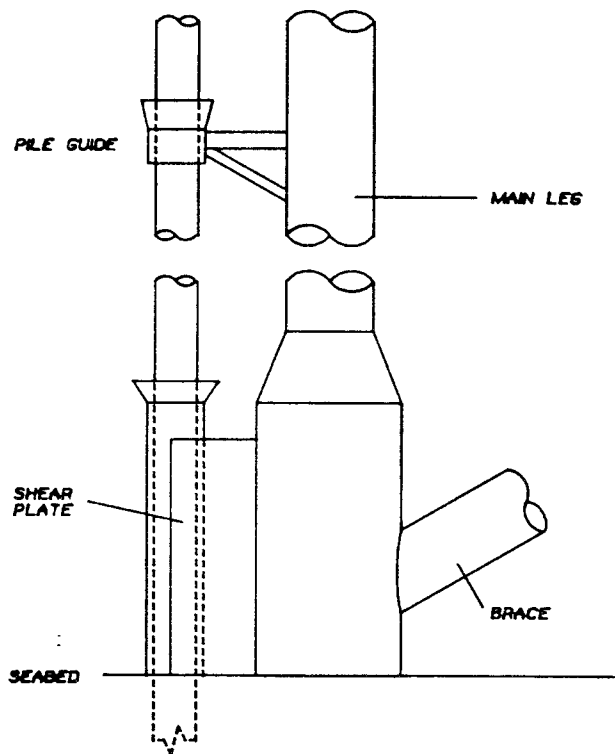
Example of steel piles placed around main leg and hammered into seabed. There are several piles per leg
